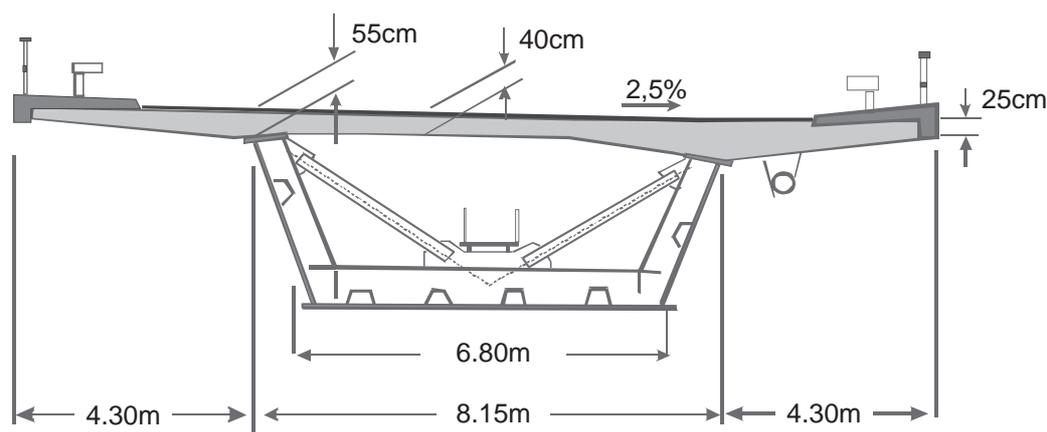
Typical cross-section of a German composite bridge with box-girder and trapezoidal stiffeners [39].
